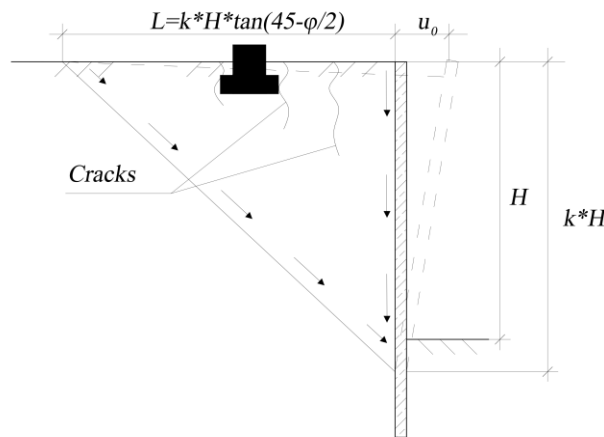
Diagram for calculating deformations of cantilever wall.
